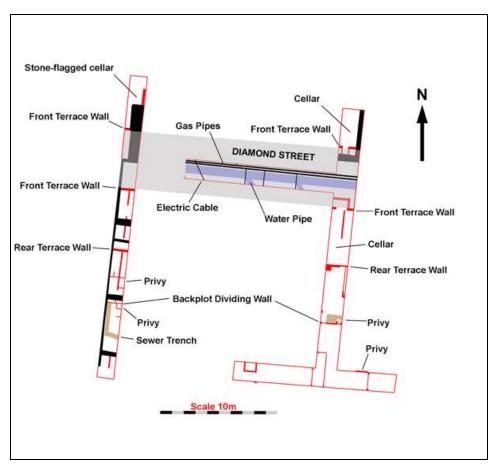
Plan of the archaeological features. The Croxton Town terraced house foundations are indicated in red. St. Michael's Lodge foundations are in black.
